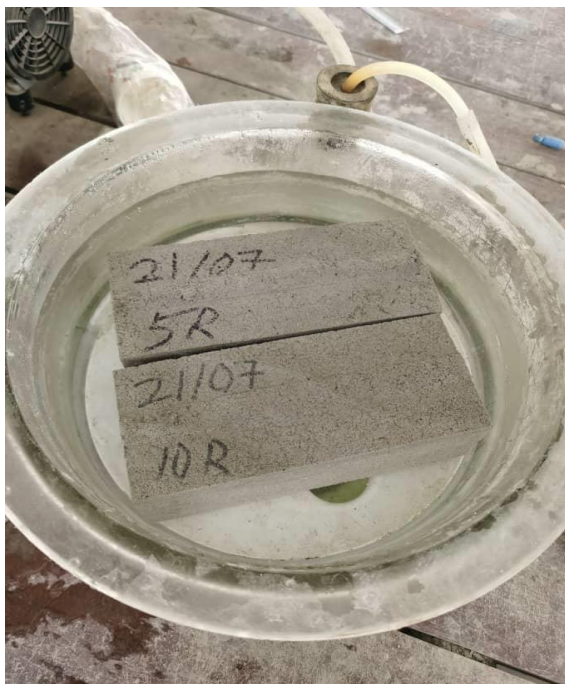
Specimen Immersed in The Vacuum Pump and Desiccator.
